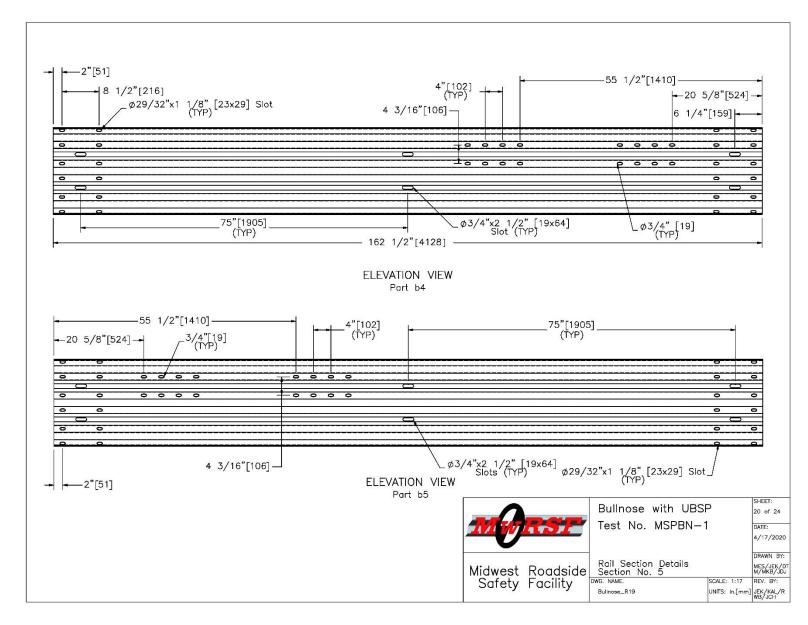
Rail Section Details Section No. 5, Test Nos. MSPBN-1 through MSPBN-3
